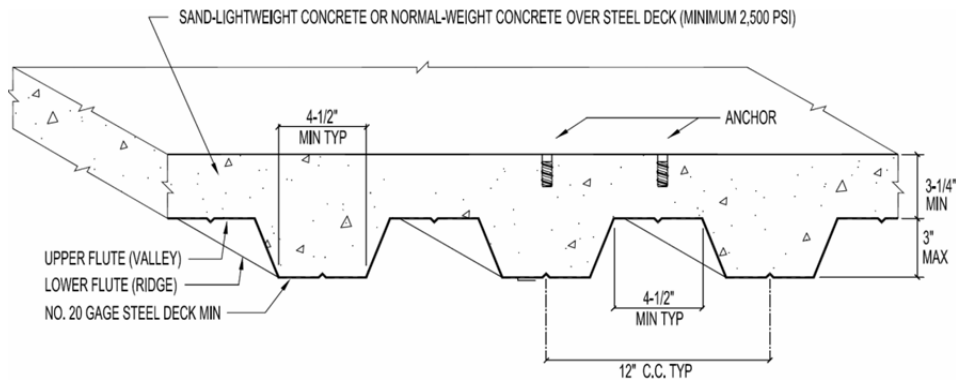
SNAKE+ INSTALLATION DETAIL FOR ANCHORS IN THE TOPSIDE OF CONCRETE-FILLED STEEL DECK FLOOR AND ROOF ASSEMBLIES<sup>1</sup>
